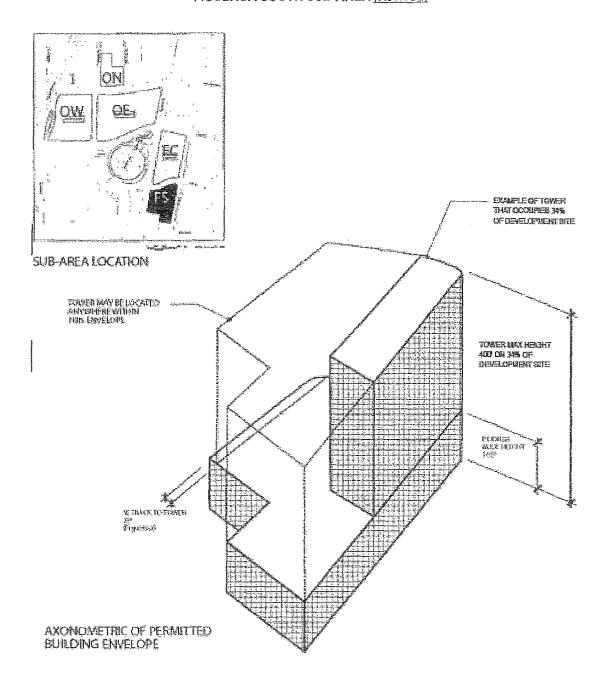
ALLOWABLE BUILDING HEIGHT & MASSING FIGUEROA CENTRAL SUB-AREA (Revised)
